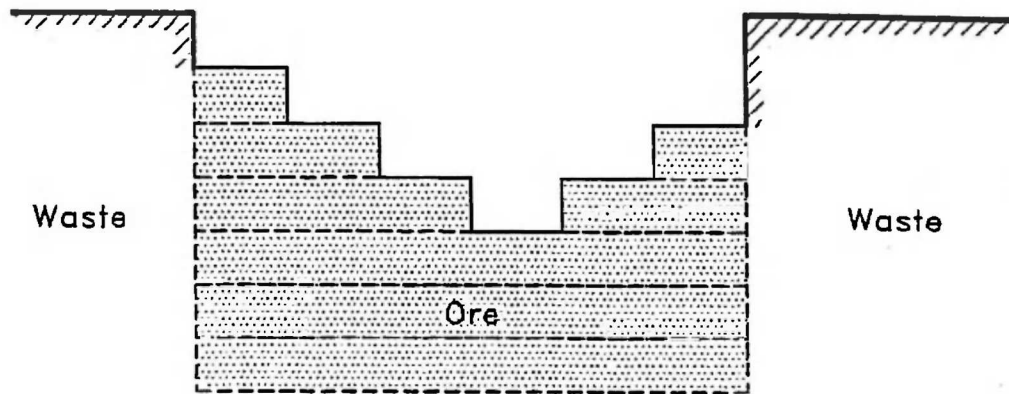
Section view showing the sterilization of reserves by ramp.
